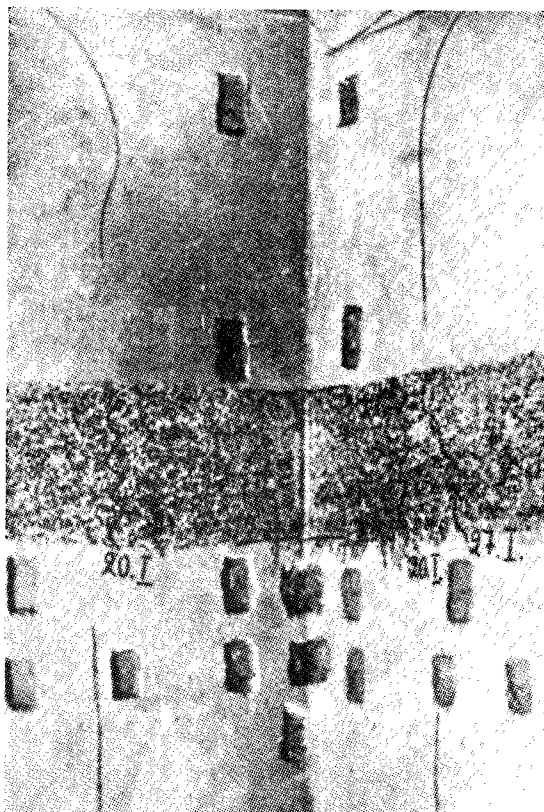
Mould test: Wall with poor heat insulation; mould formation on the entire wall area covered with a nutrient medium. Insanitary conditions. Additional heat insulation of walls and corners is required.
